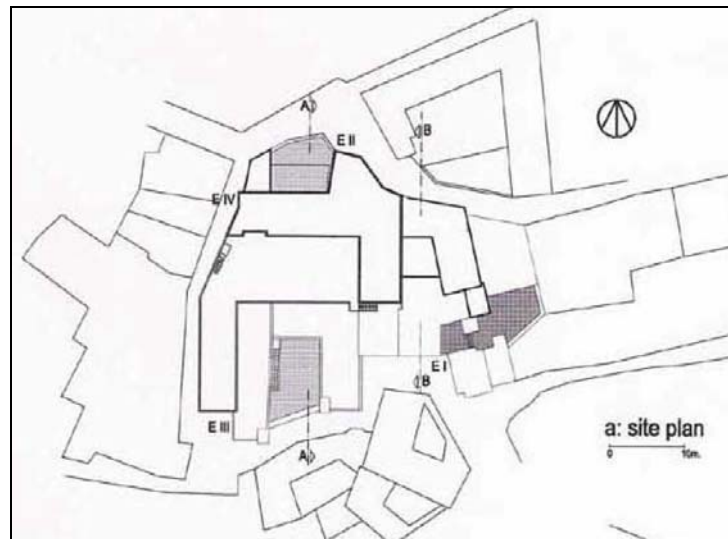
a: Site Plan (Alioğlu (2003.132-133)
